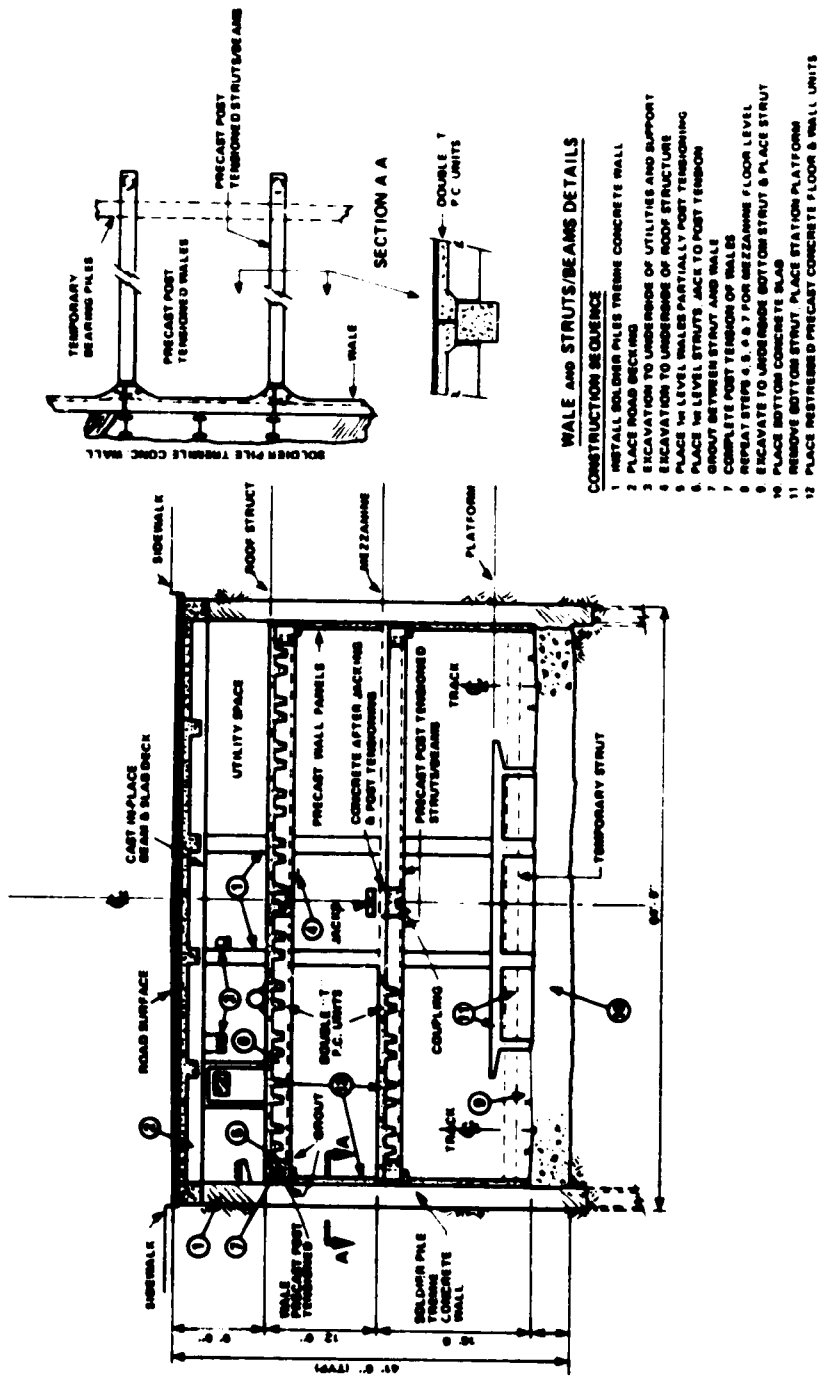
Cut-and-Cover Station - Permanent Road Deck, Precast Concrete Unit Construction
